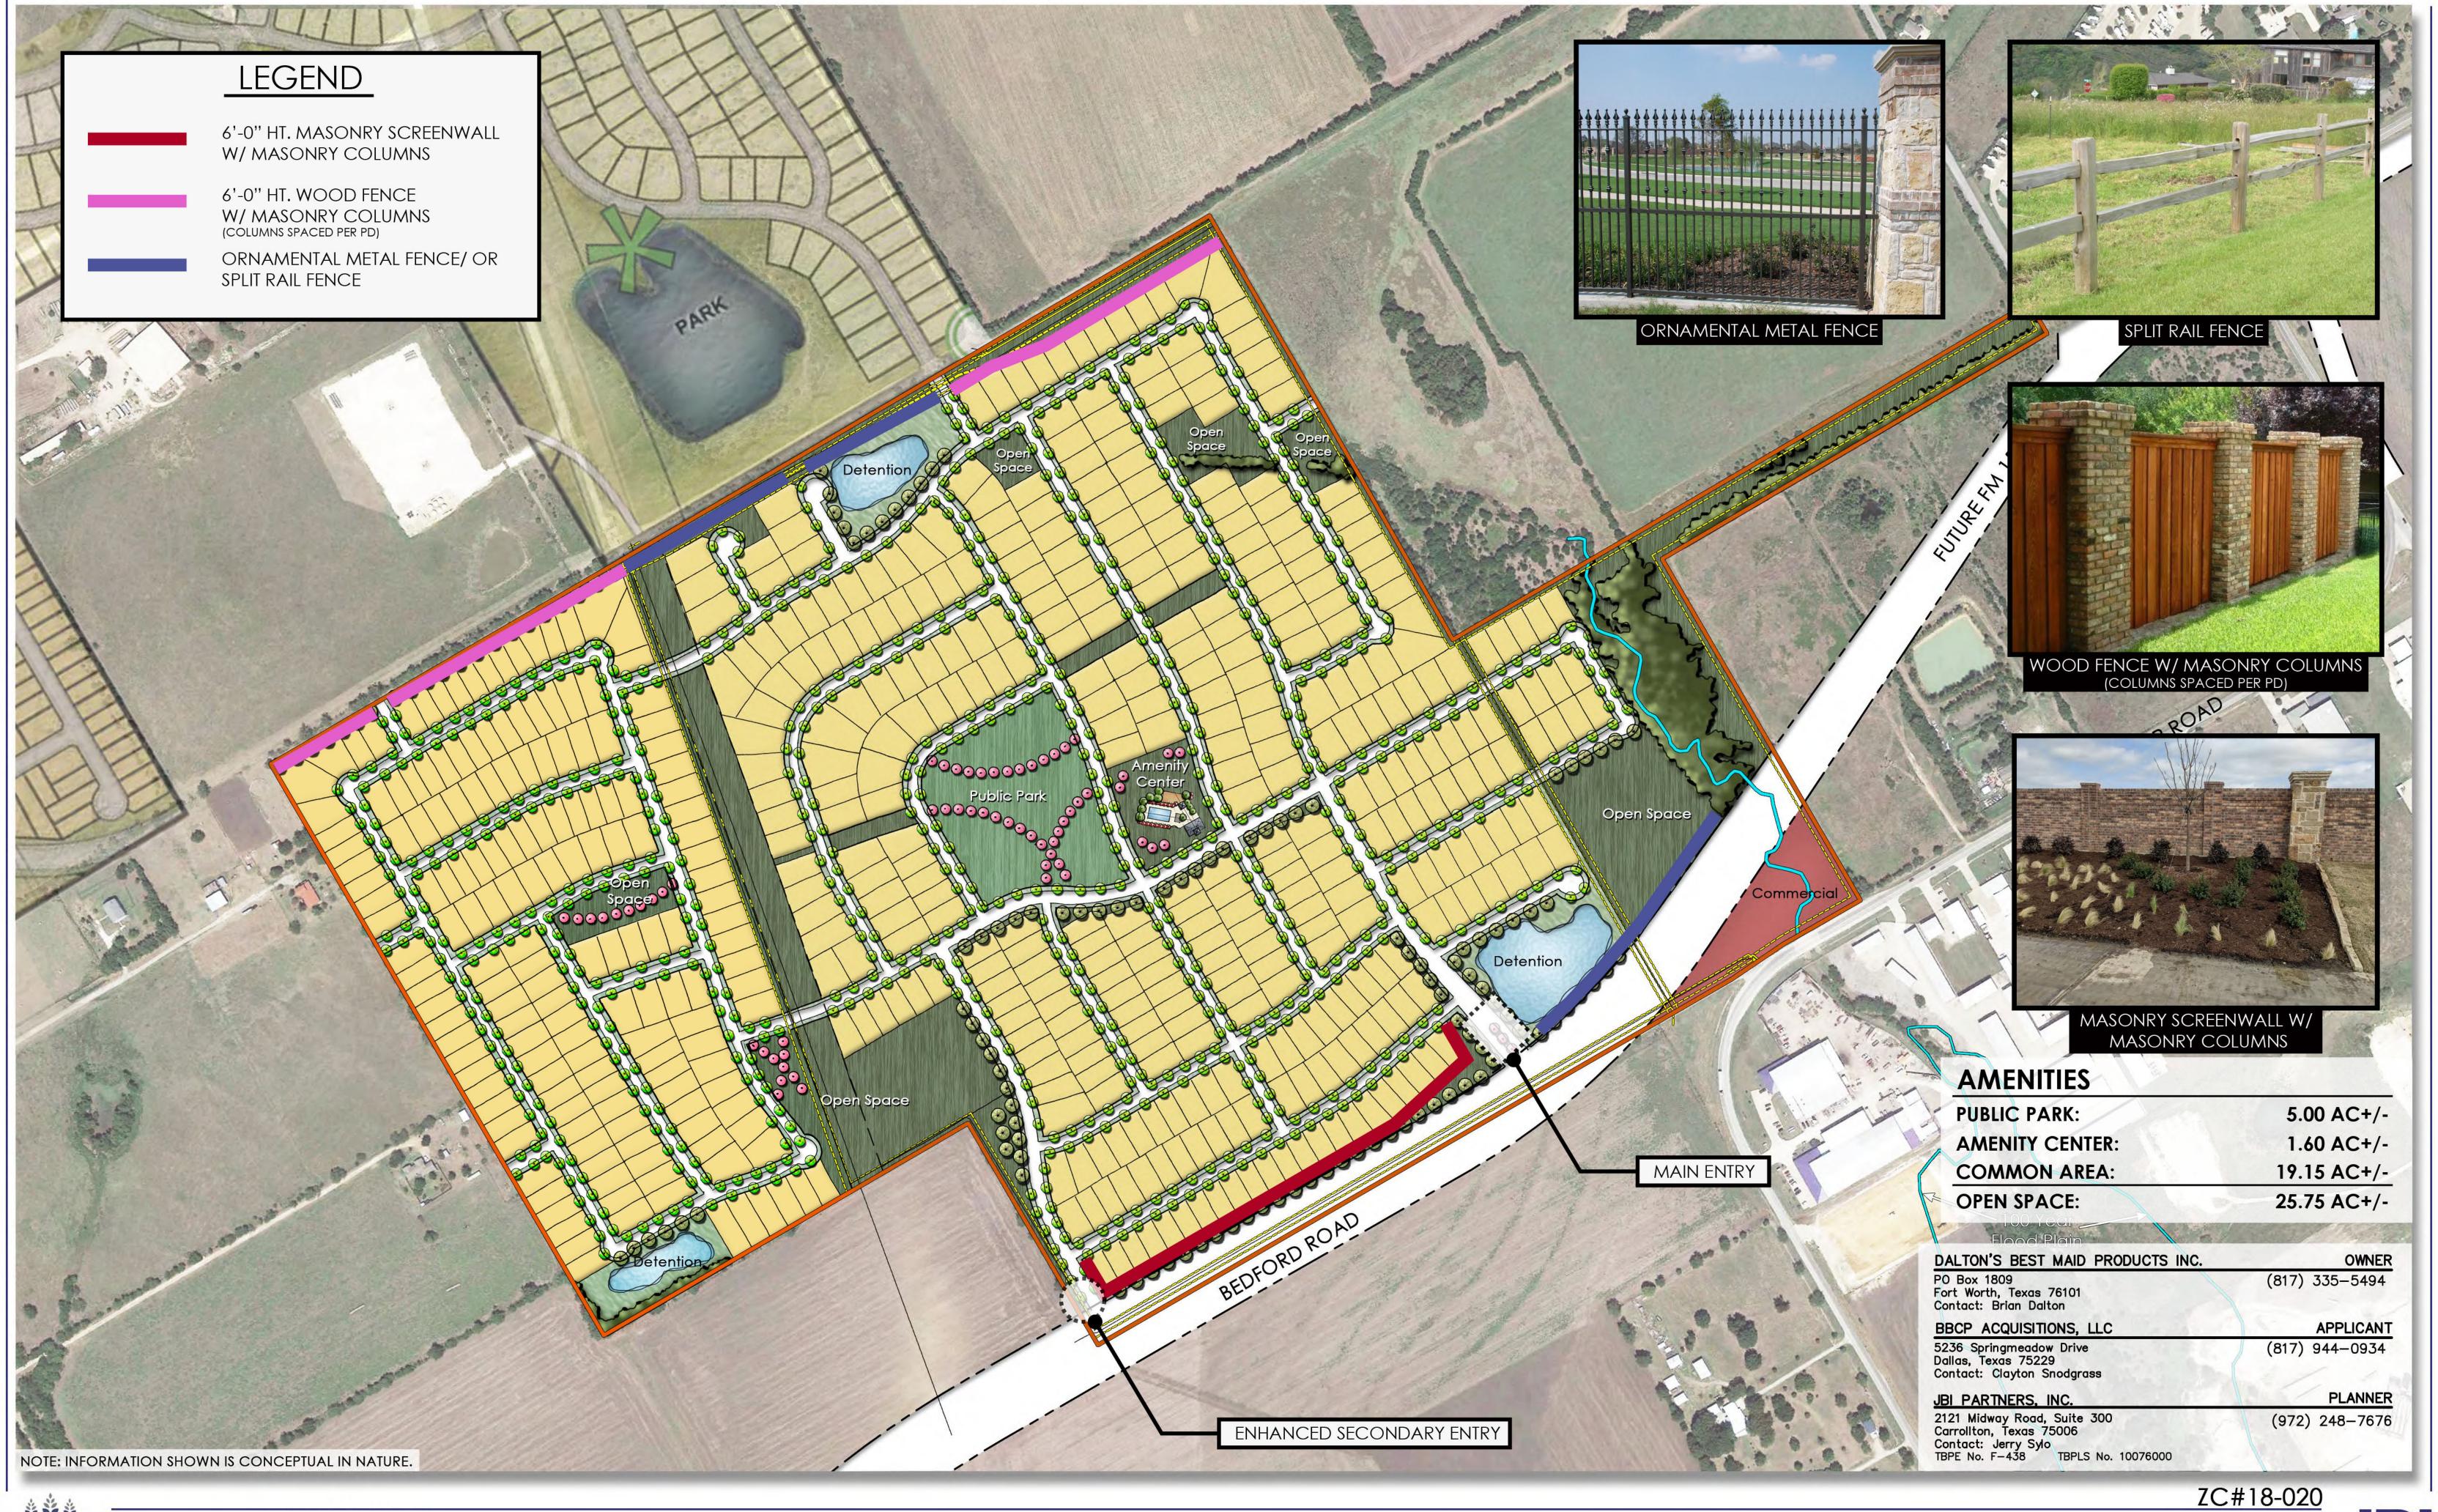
OPEN SPACE/AMENITY PLAN MANSFIELD, TEXAS PARTNERS
